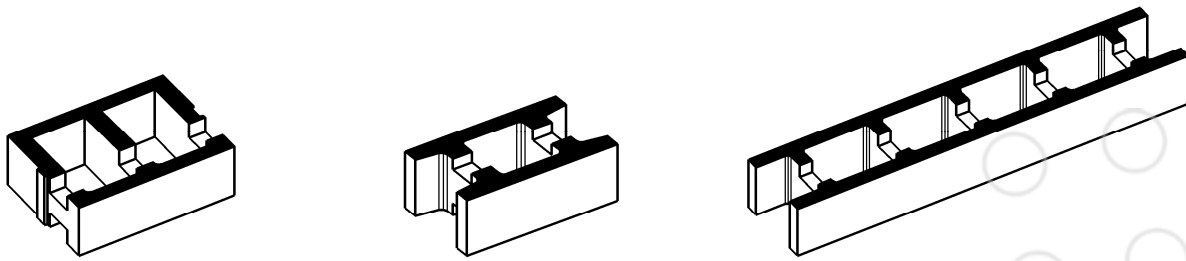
Examples of shuttering blocks without additional thermal insulation
